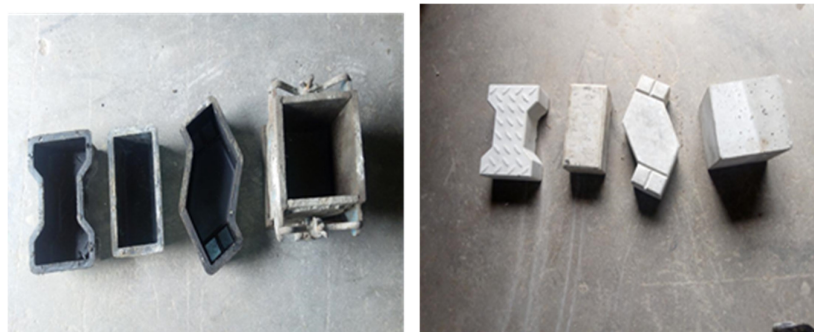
Pavers and cube moulds as well as concrete pavers plus cube
